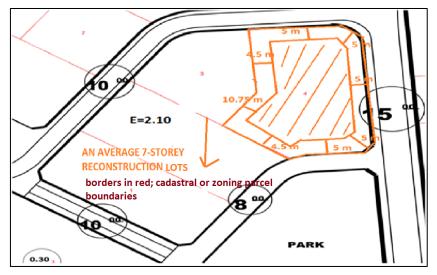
A Reconstruction Lots with a Total Construction Value of 2.10
